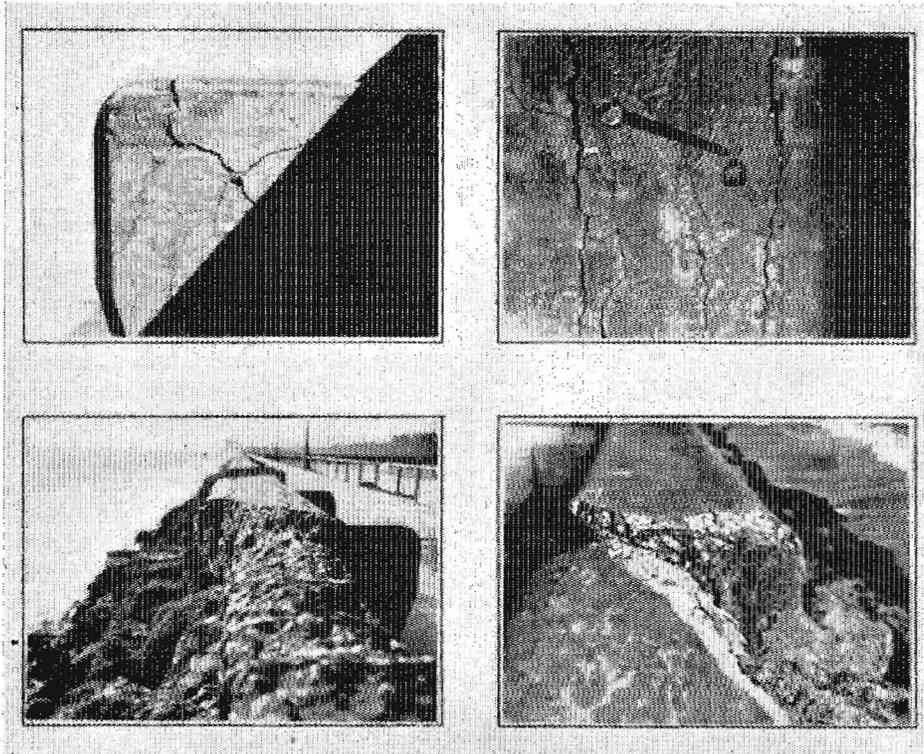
Cracks in sea wall at Santa Barbara
